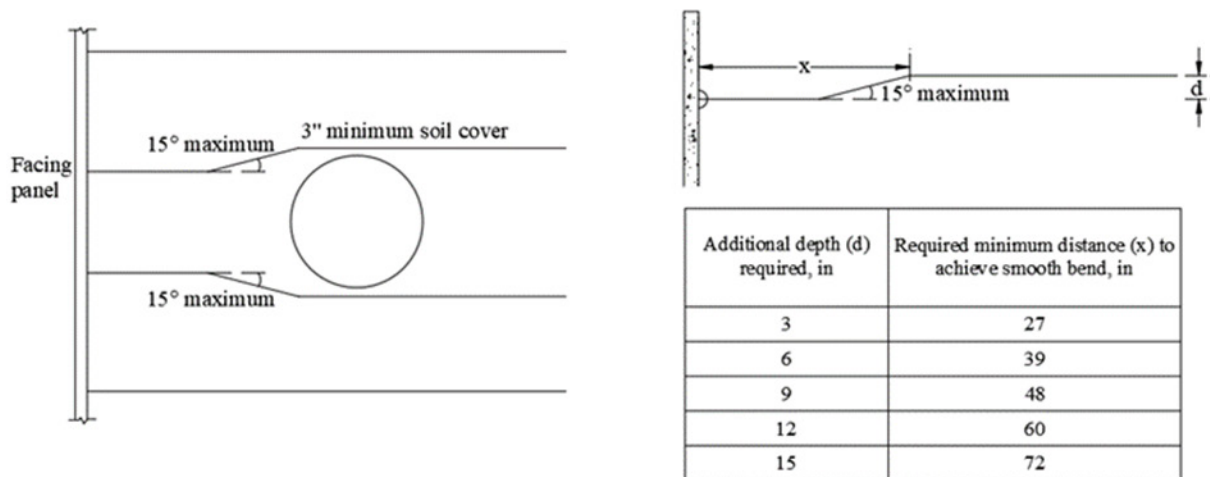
Requirements for Horizontal Obstructions Within the Reinforced Soil Mass (Redrawn From FHWA, 2009).
